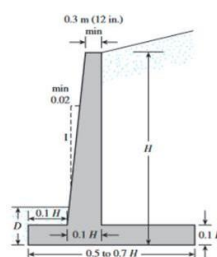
Estimated Dimensions of the Retaining Wall for Cantilever Wall Stability Analysis Source: Das, 2016
